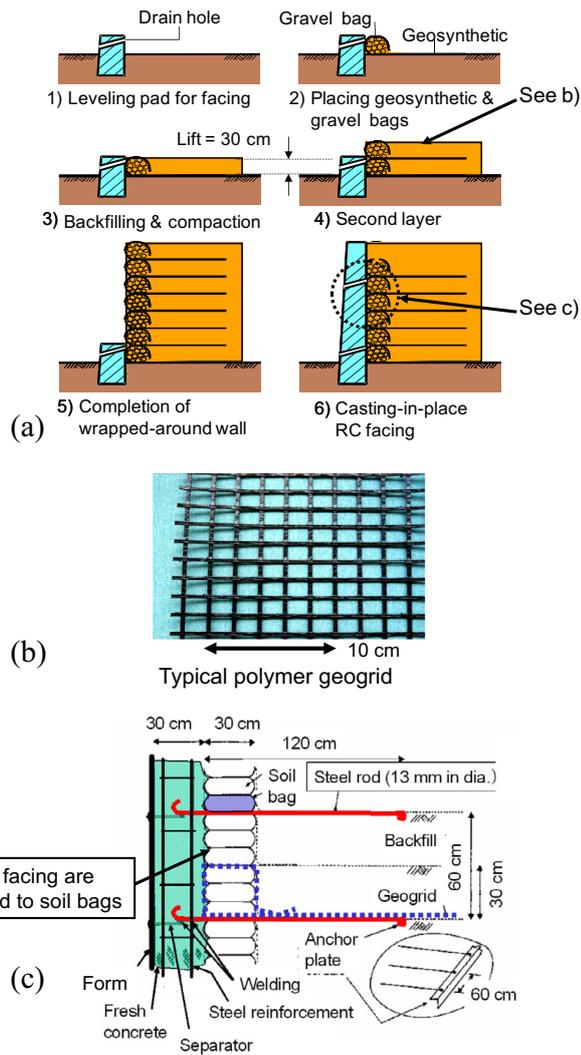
GRS RW with FHR facing: (a) staged construction; (b) a typical geogrid; and (c) details of facing construction (Tatsuoka et al., 1987).
